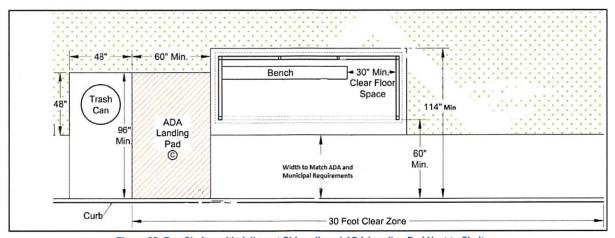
Bus Shelter with Adjacent Sidewalk and ADA Landing Pad Next to Shelter.
